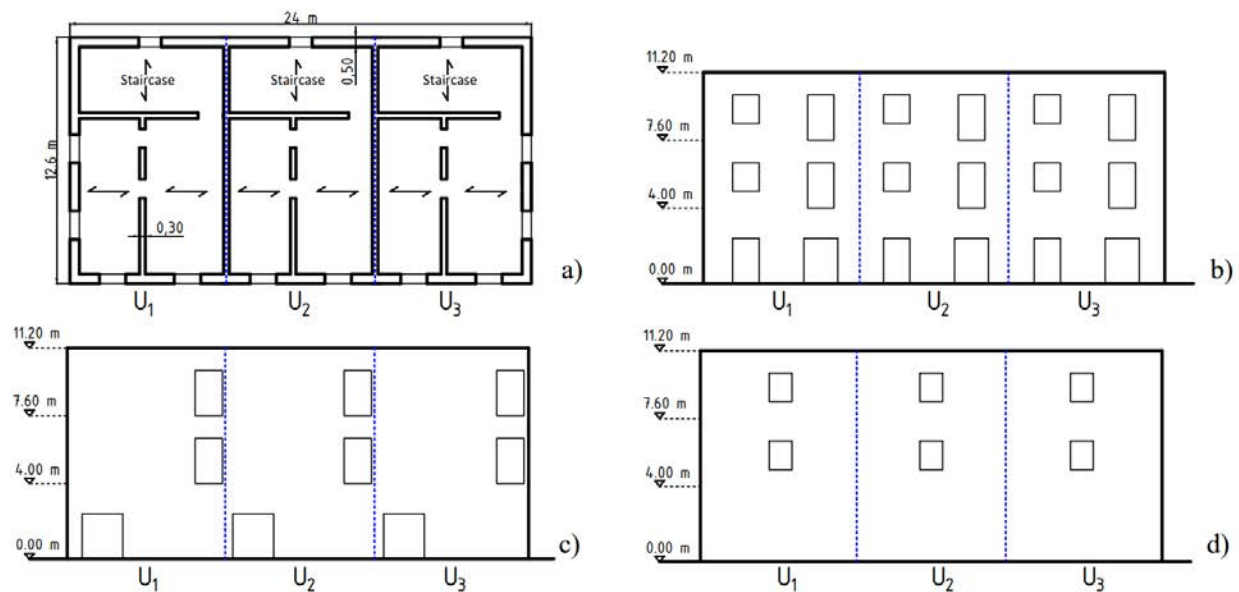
Reference Aggregate's geometry: a) Plan of the first storey; b) Front wall; c) Middle wall d) Back wall.
